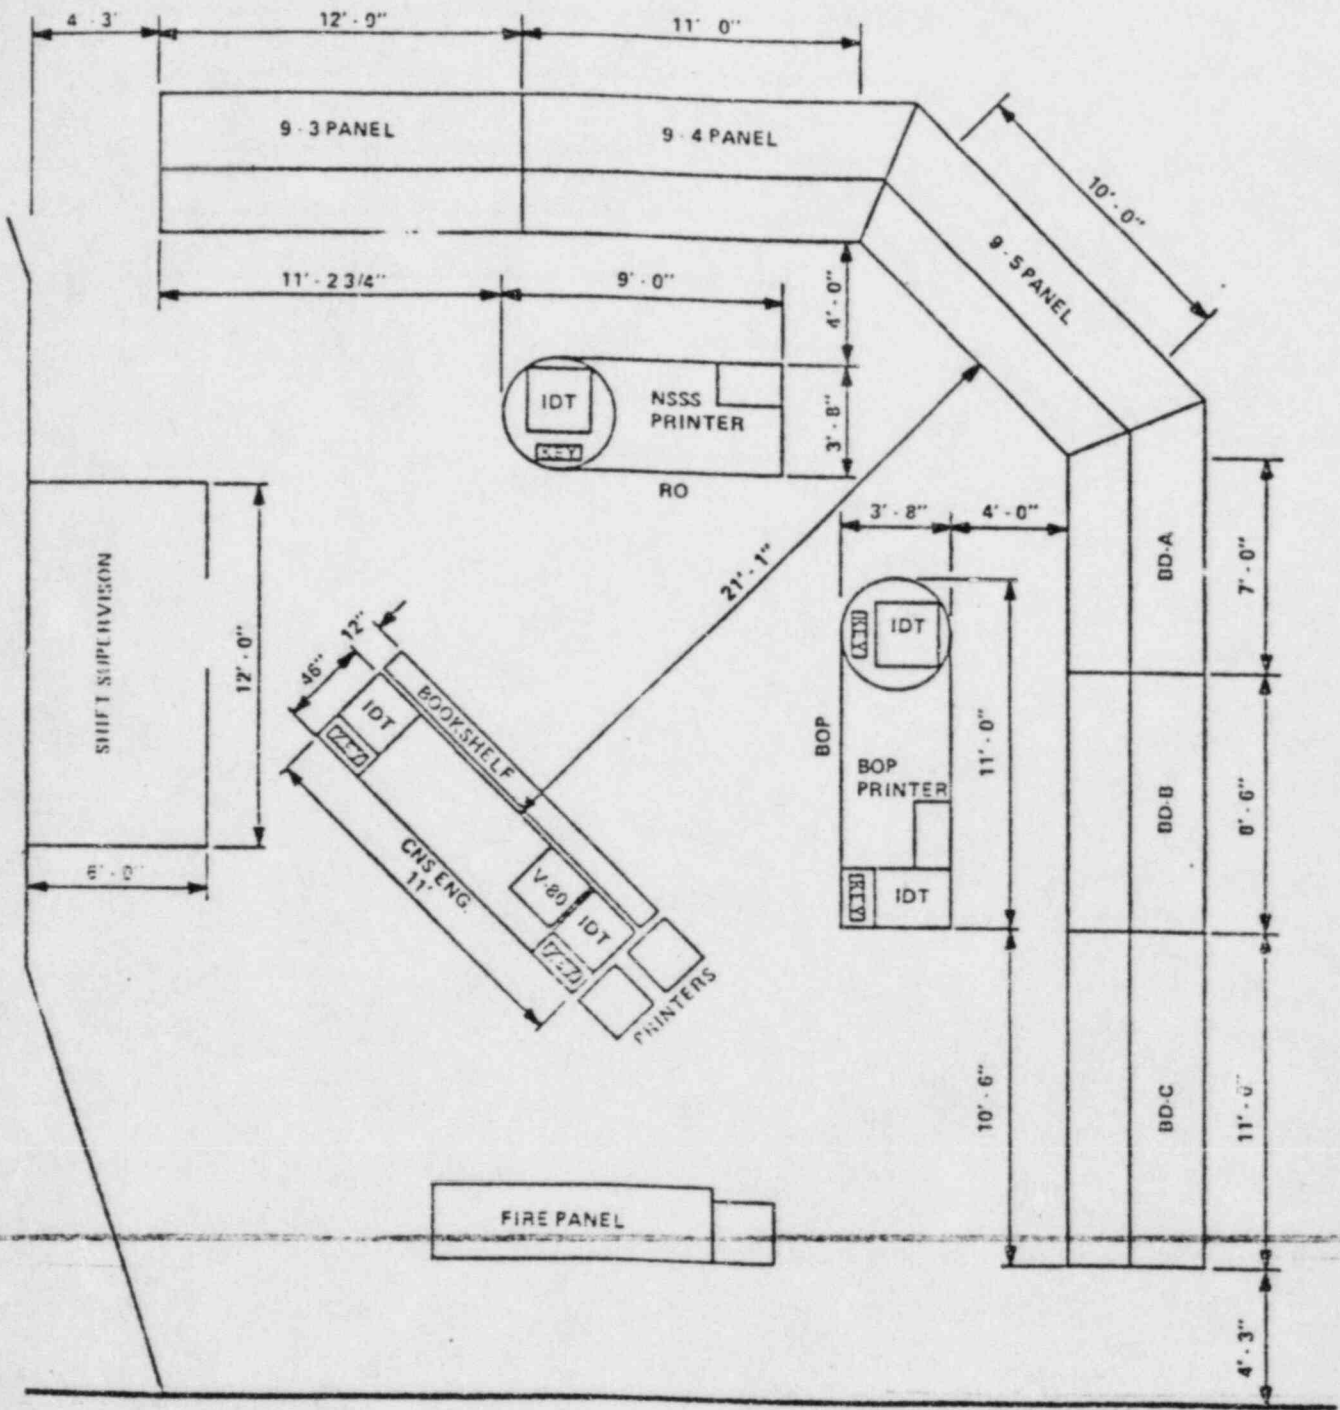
A PROPOSED CNS CONTROL ROOM LAYOUT
